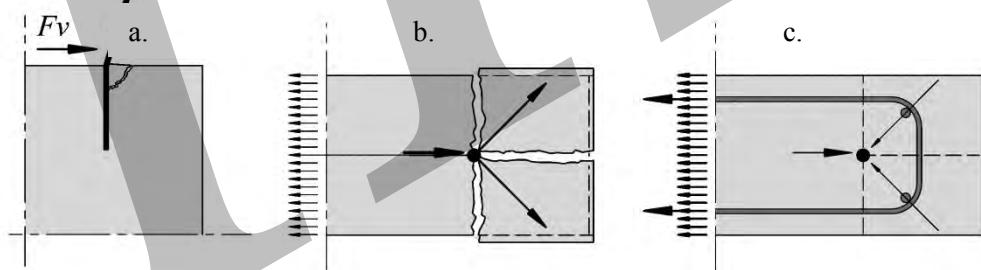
Splitting effects around dowel pin loaded in shear with a. basic load case, b. potential planes of cracking and c. strut-and-tie model for design of splitting reinforcement
